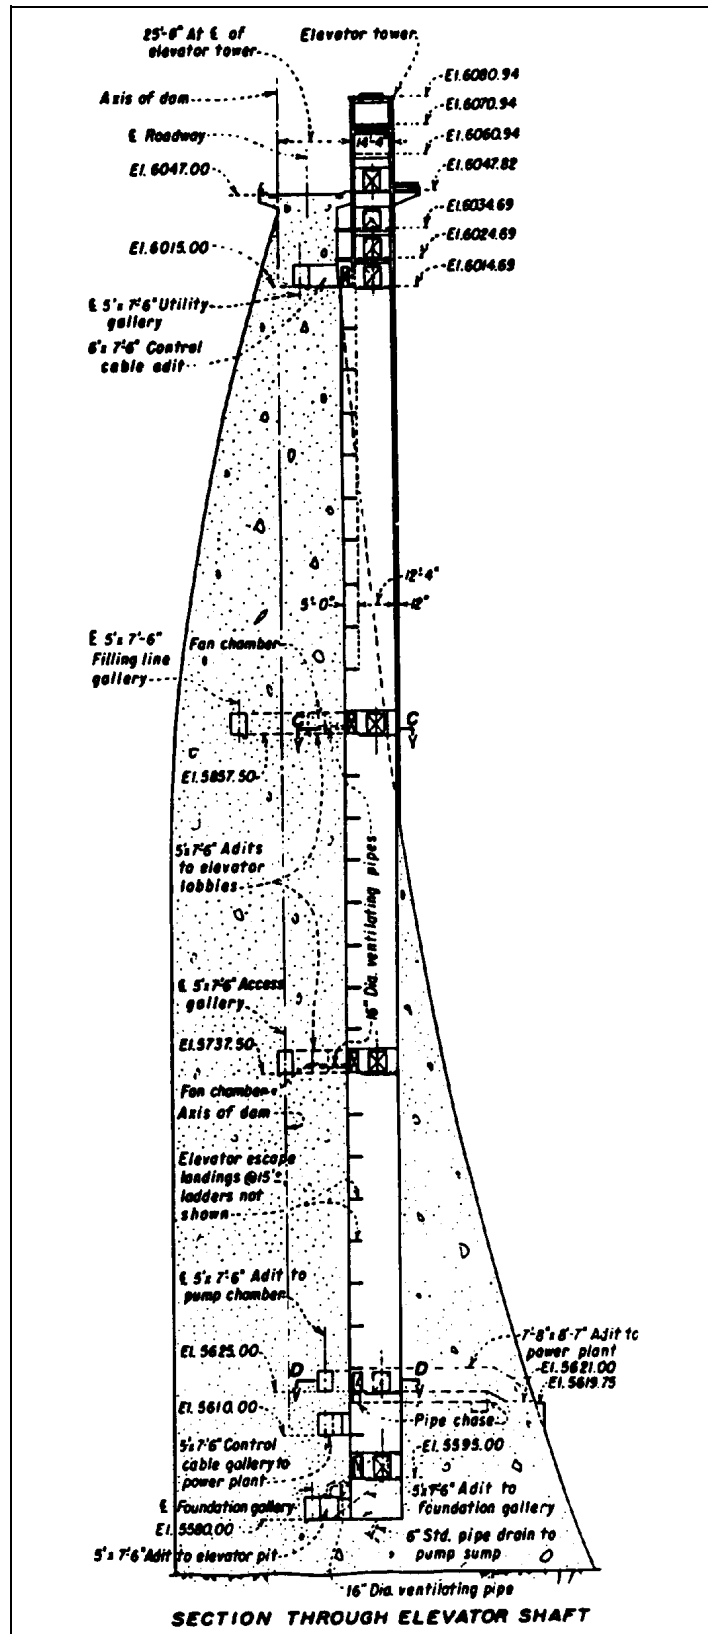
Structural and architectural layout of elevator shaft and tower in Flaming Gorge Dam (USBR) (Continued)
